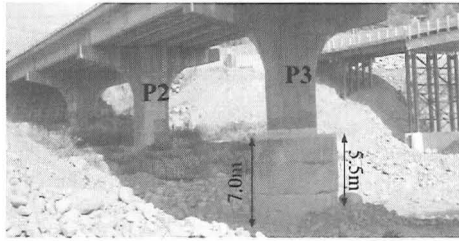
Foundation exposure of Wensui Bridge at the field measurement.
